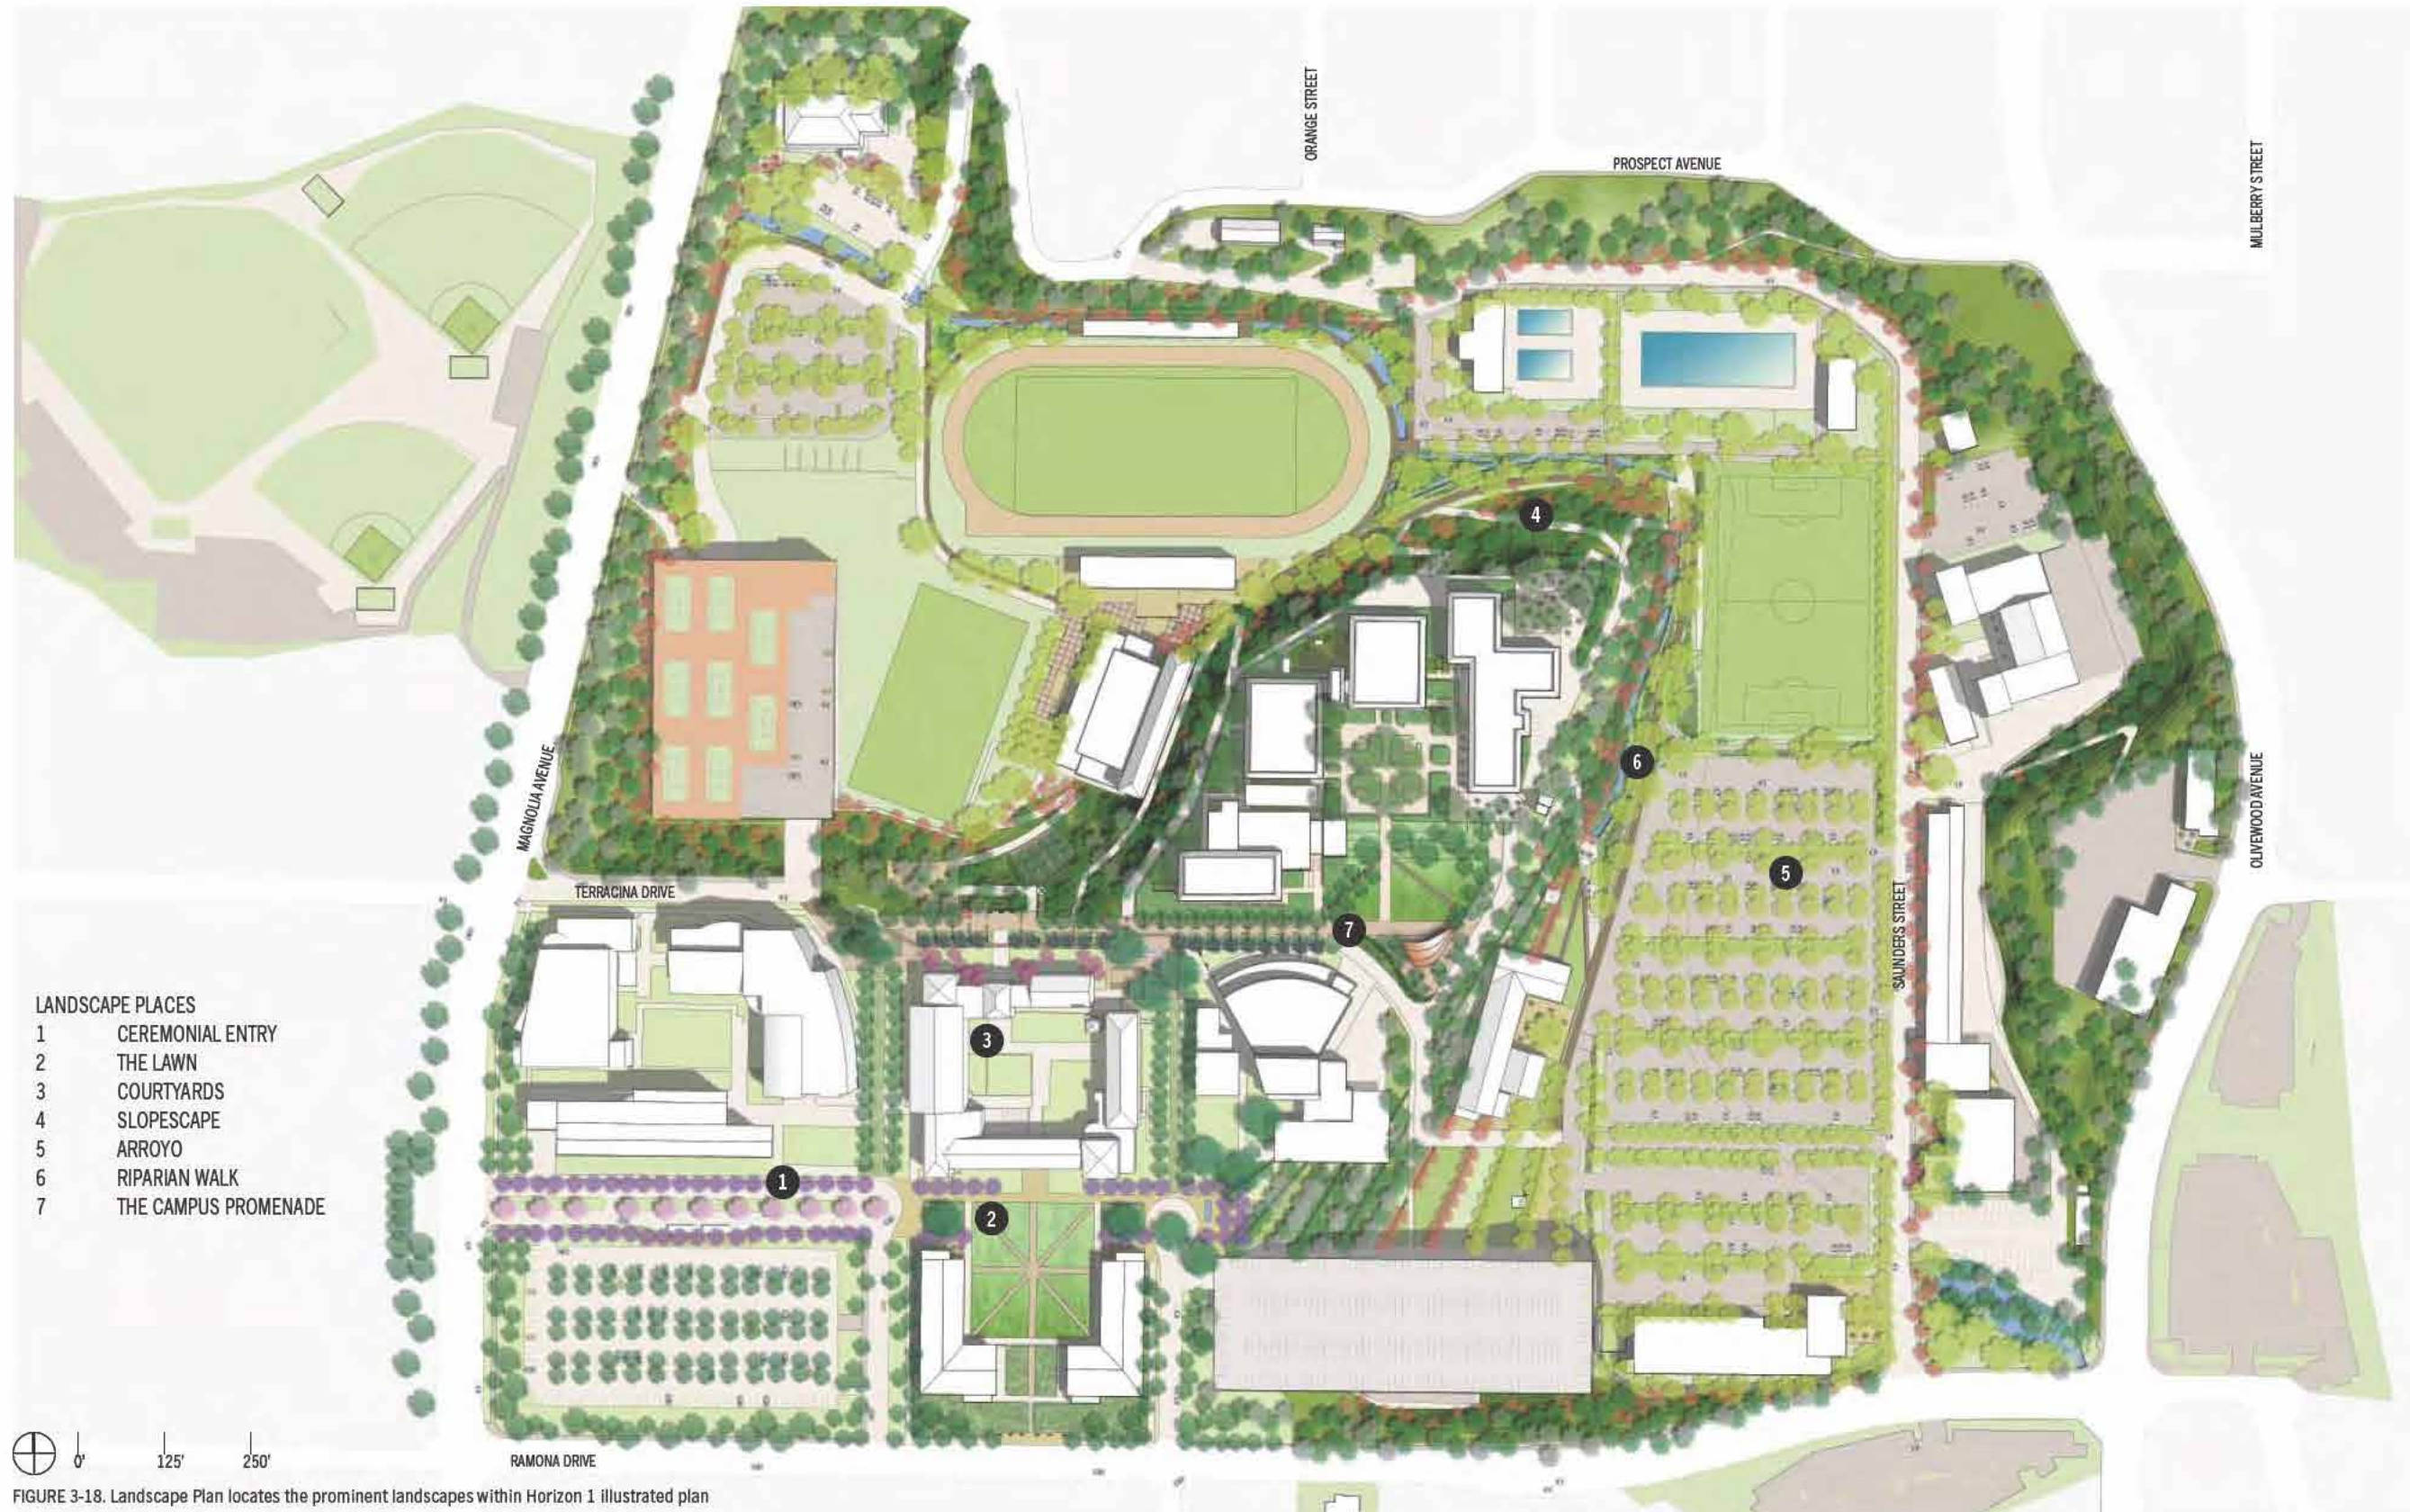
Landscape Plan locates the prominent landscapes within Horizon 1 illustrated plan
